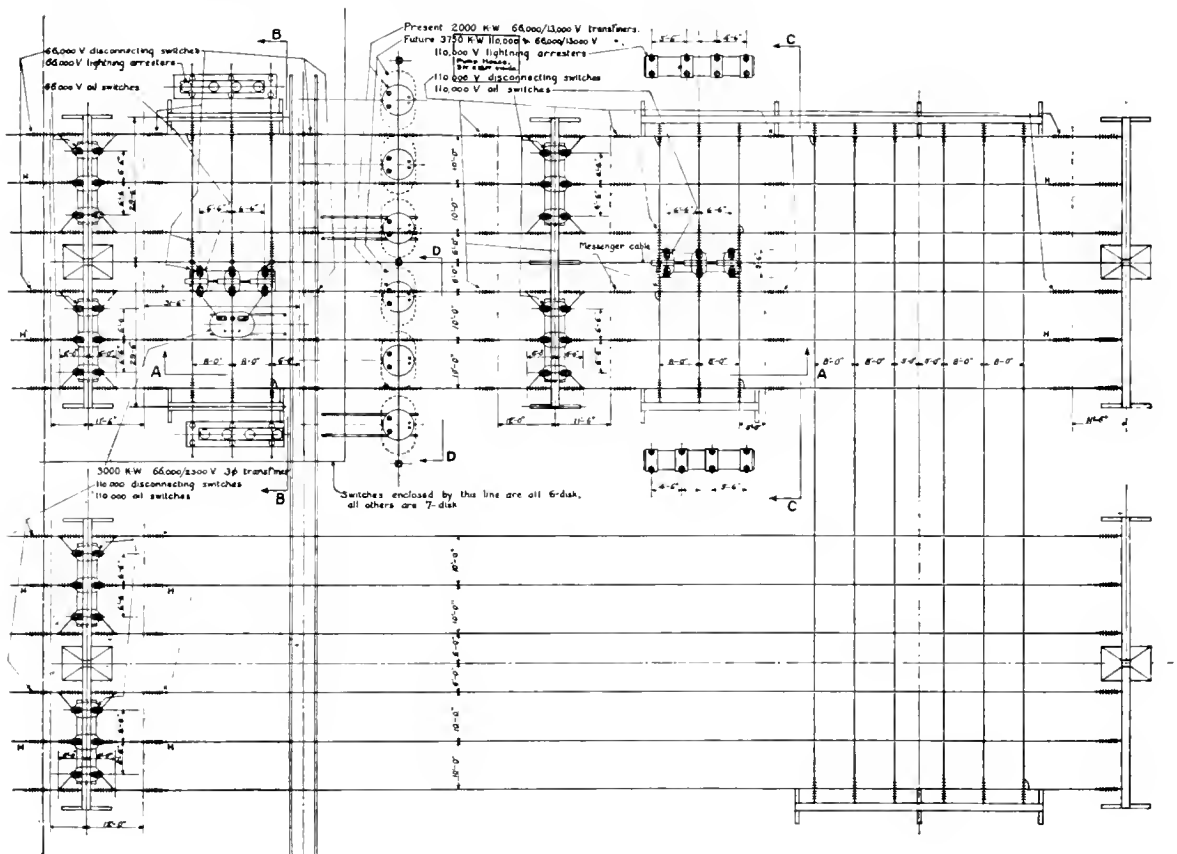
Millbury Substation Arrangement of Outdoor Equipment
